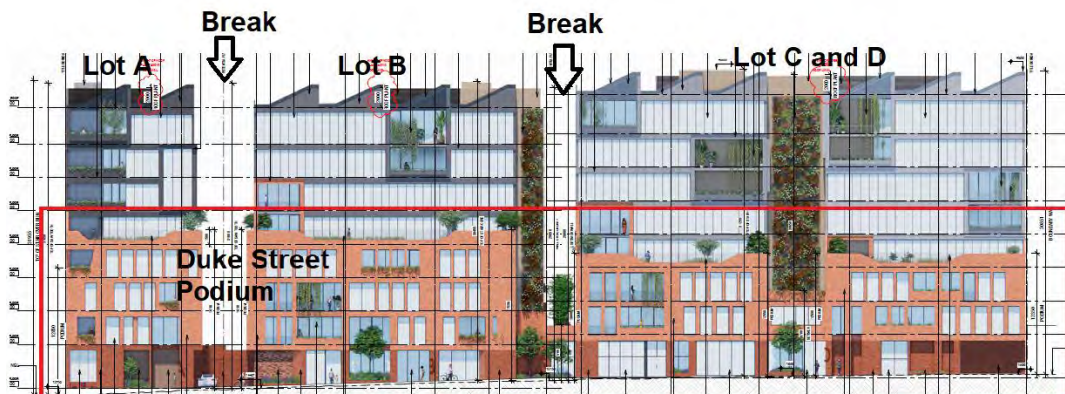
Proposed Duke Street elevation with podium emphasised and building breaks
